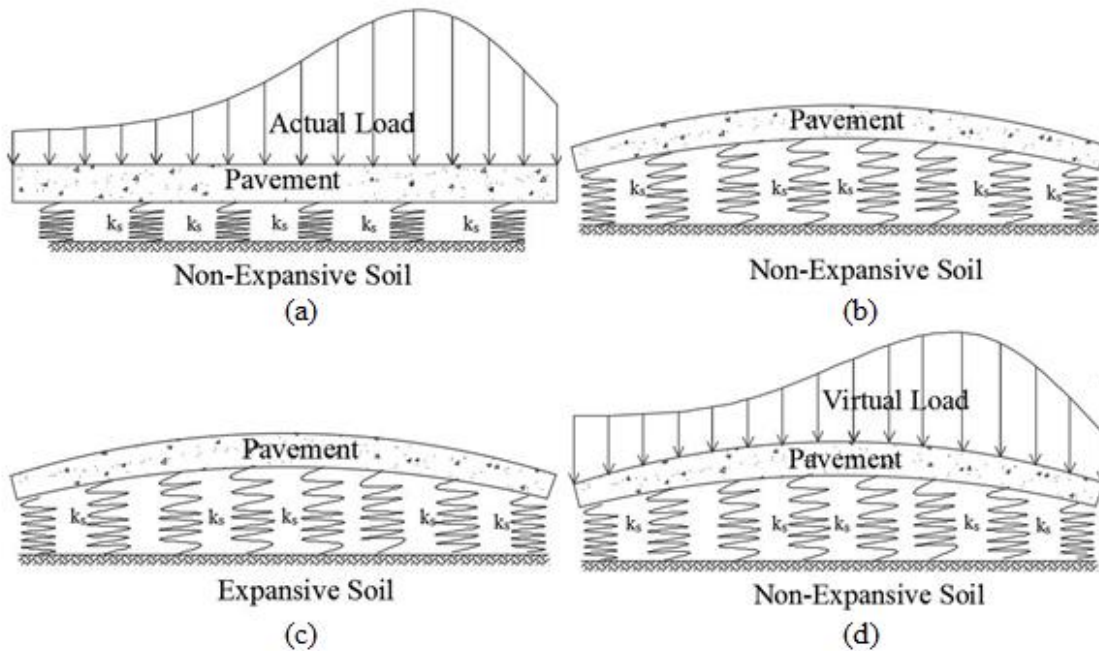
(a) Pavement on a Regular Soil, (b) Pavement Deflection Due to External Load, (c) Pavement Deflection Due to Expansive Soil's Volume Change, and (d) Proposed Virtual Load Soil Model (Adapted from Khan 2017).
